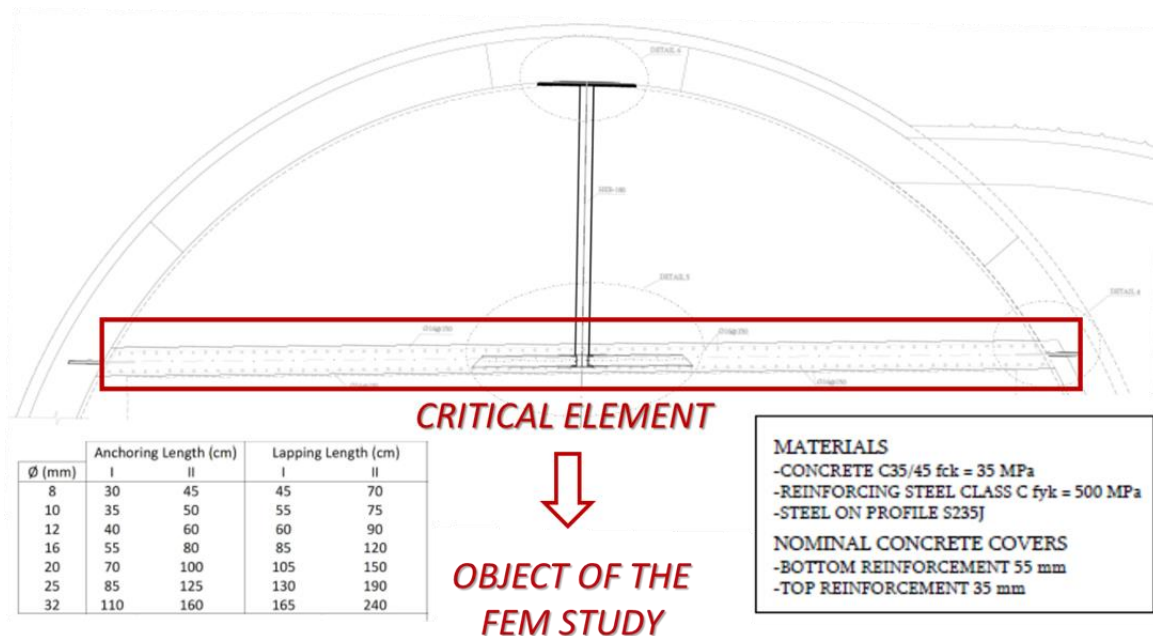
Details of the suspended deck and steel tendon sustaining it.
